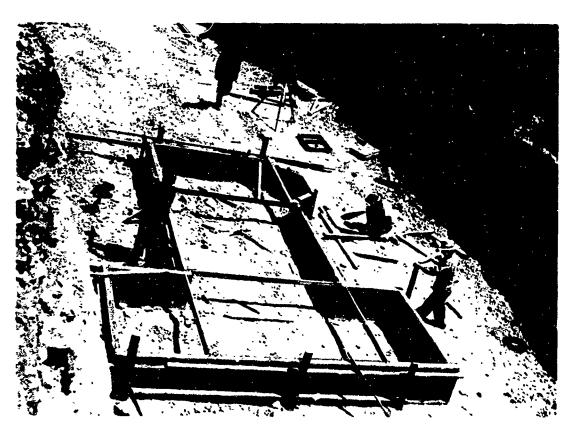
Structure II-3, erecting base slab formwork (May 3, 1957).
